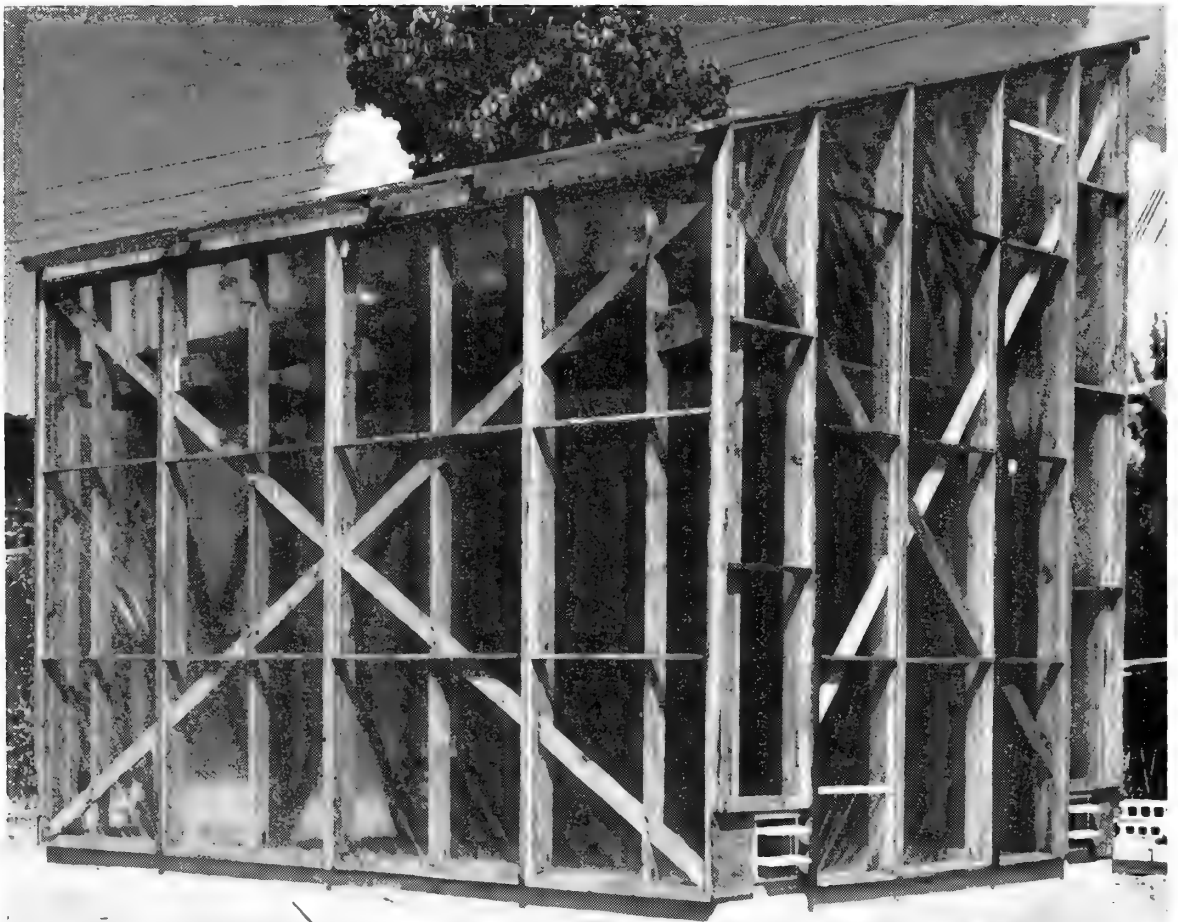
Solar Drier. Note open vents at bottom, and black plates underneath roof for maximum insolation.
